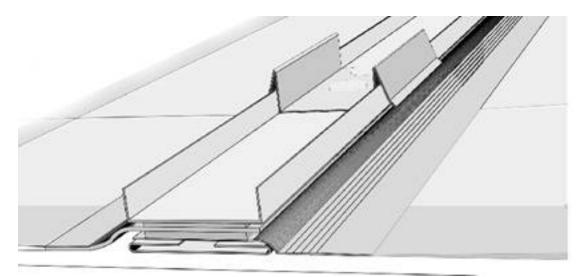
Design Rev. 1—clamping batten with base channel clamping strip Photo Credit: Uni-Solar
